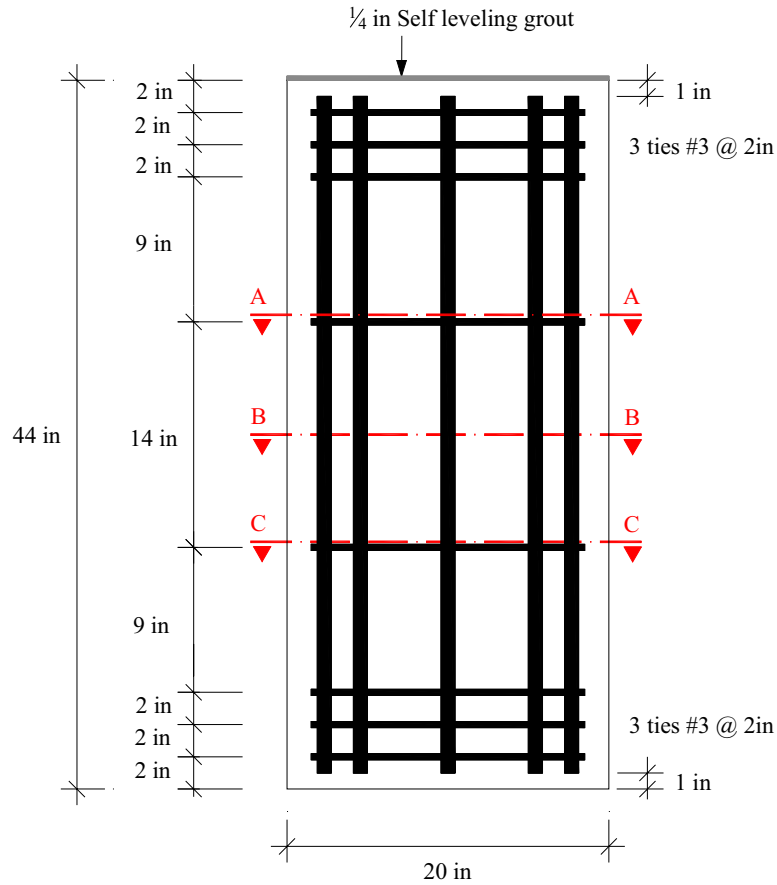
Longitudinal Cross Section; Specimens A1, A2 & A3
